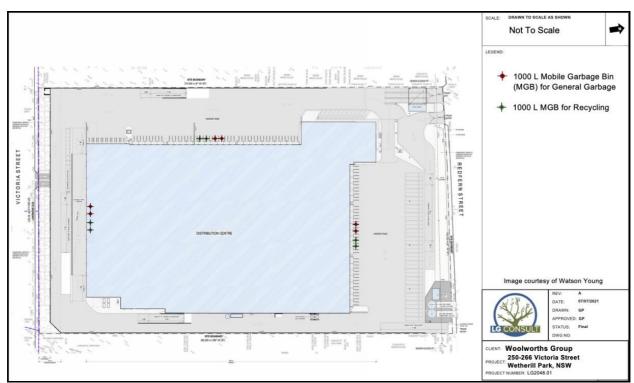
Proposed Construction Waste Bin Locations (LG Consult, 2021)
